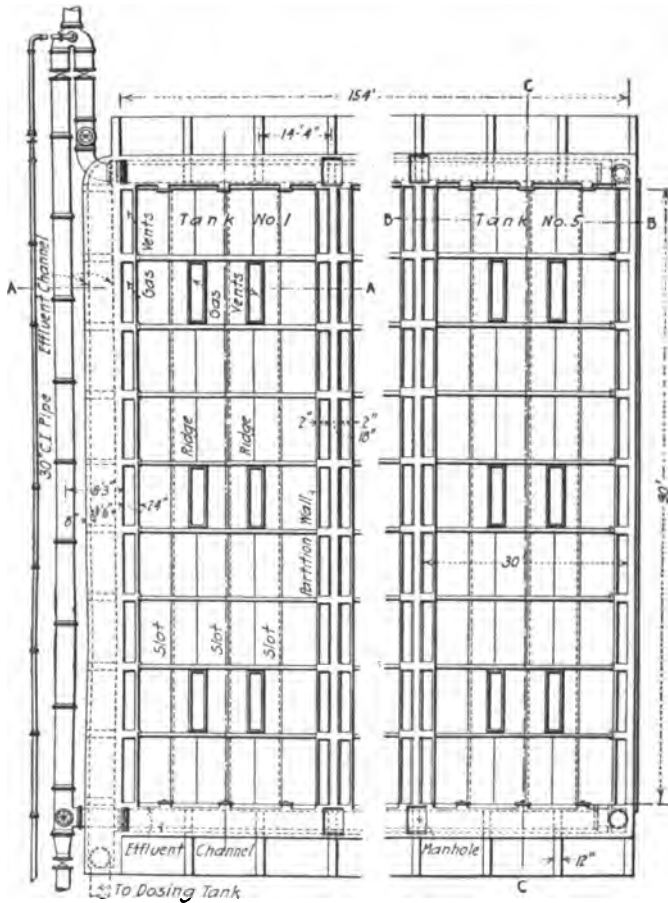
Partial plan of Imhoff tanks, Fitchburg, Mass.
